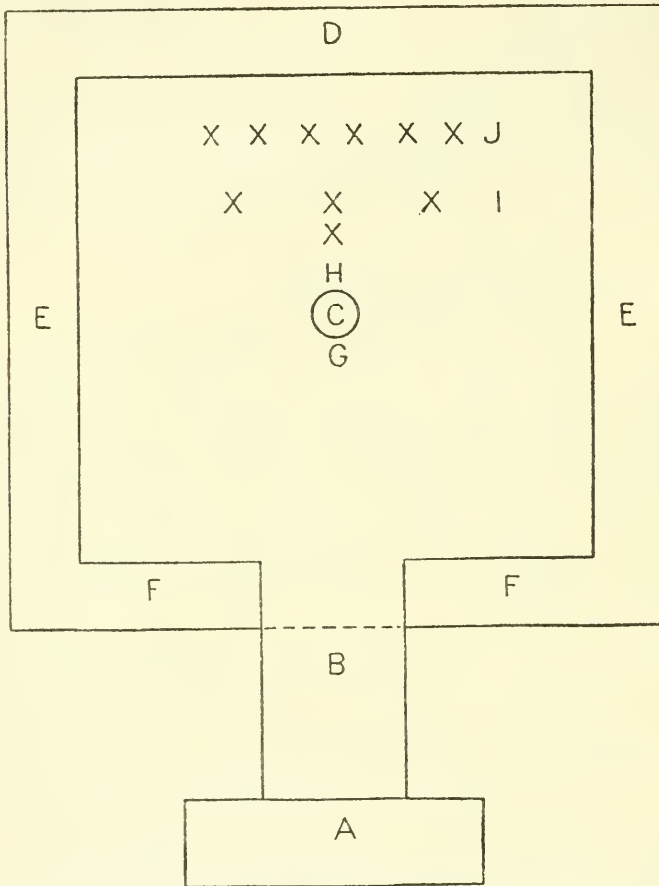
Floor plan, showing interior arrangement of the *Kázgi*, and positions of the dancers and guests.
